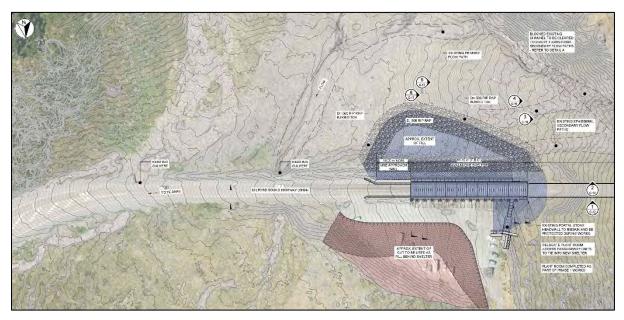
Design drawing showing the proposed new avalanche shelter. The red area indicates the proposed fill excavation site and blue indicates where the material will be deposited (not to scale).⁷⁰
